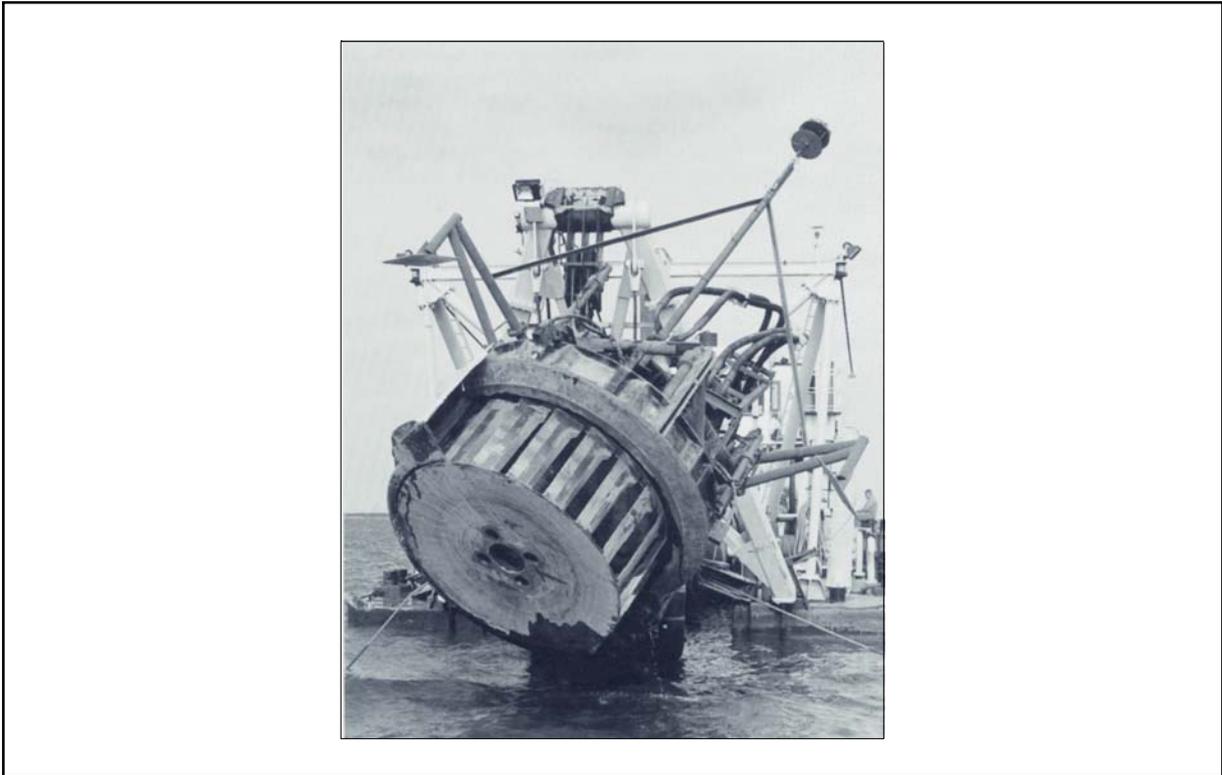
Cylindrical-shaped Disc Bottom Dredger
